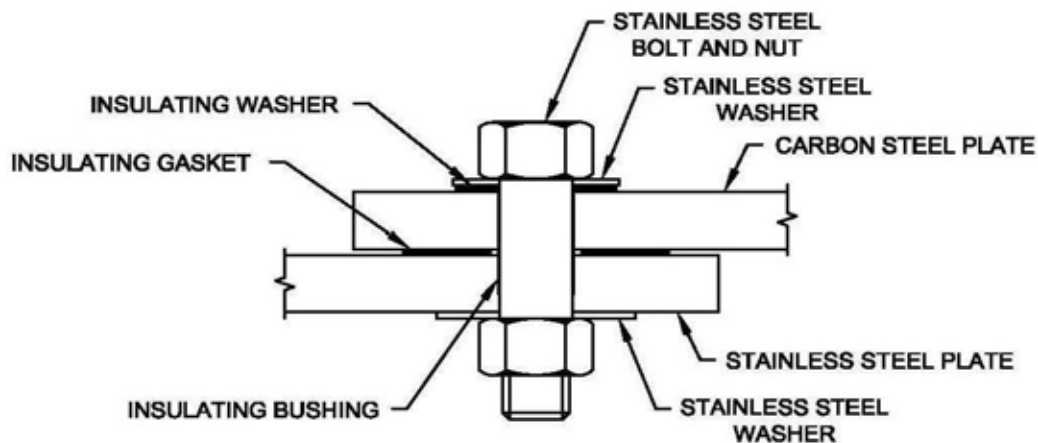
Typical Bolted Connection with Carbon Steel Elements
